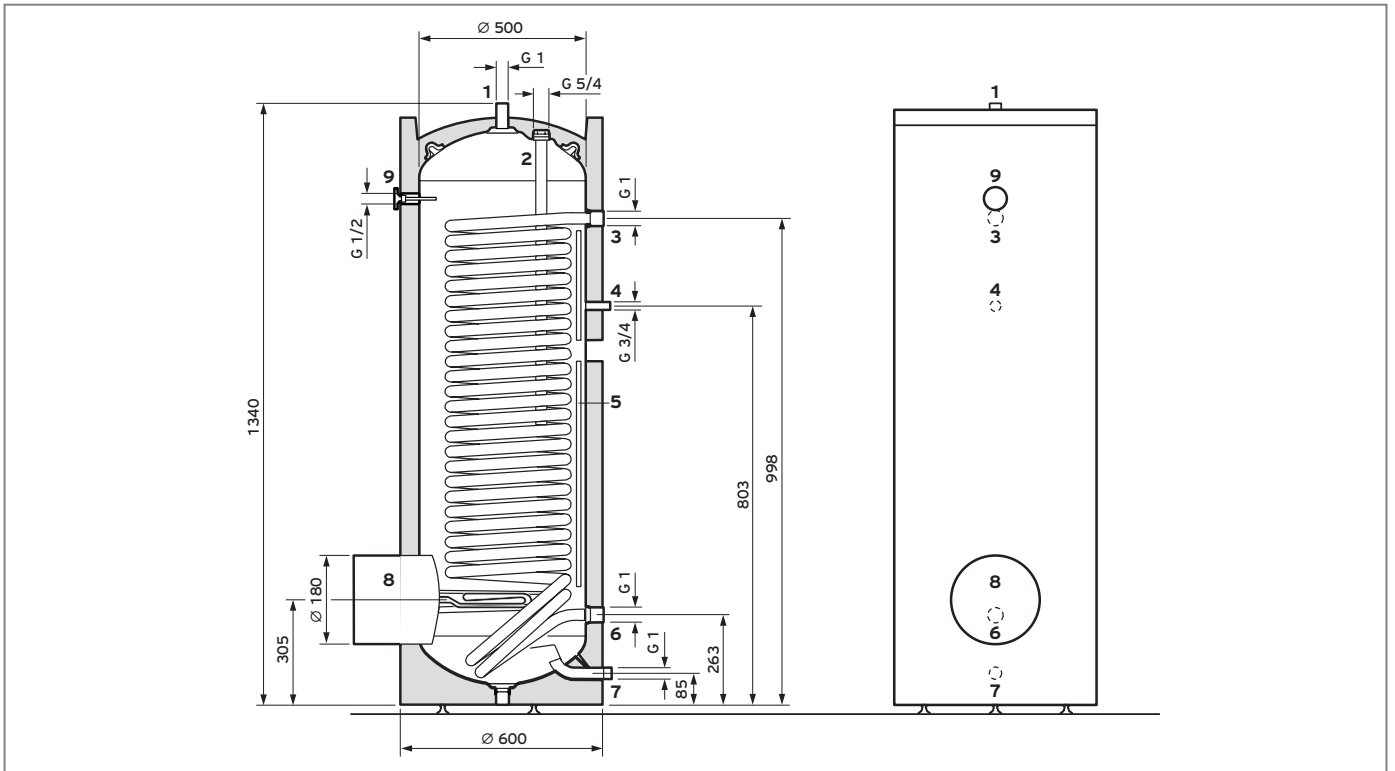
uniSTOR VIH RW 200 connection dimensions
